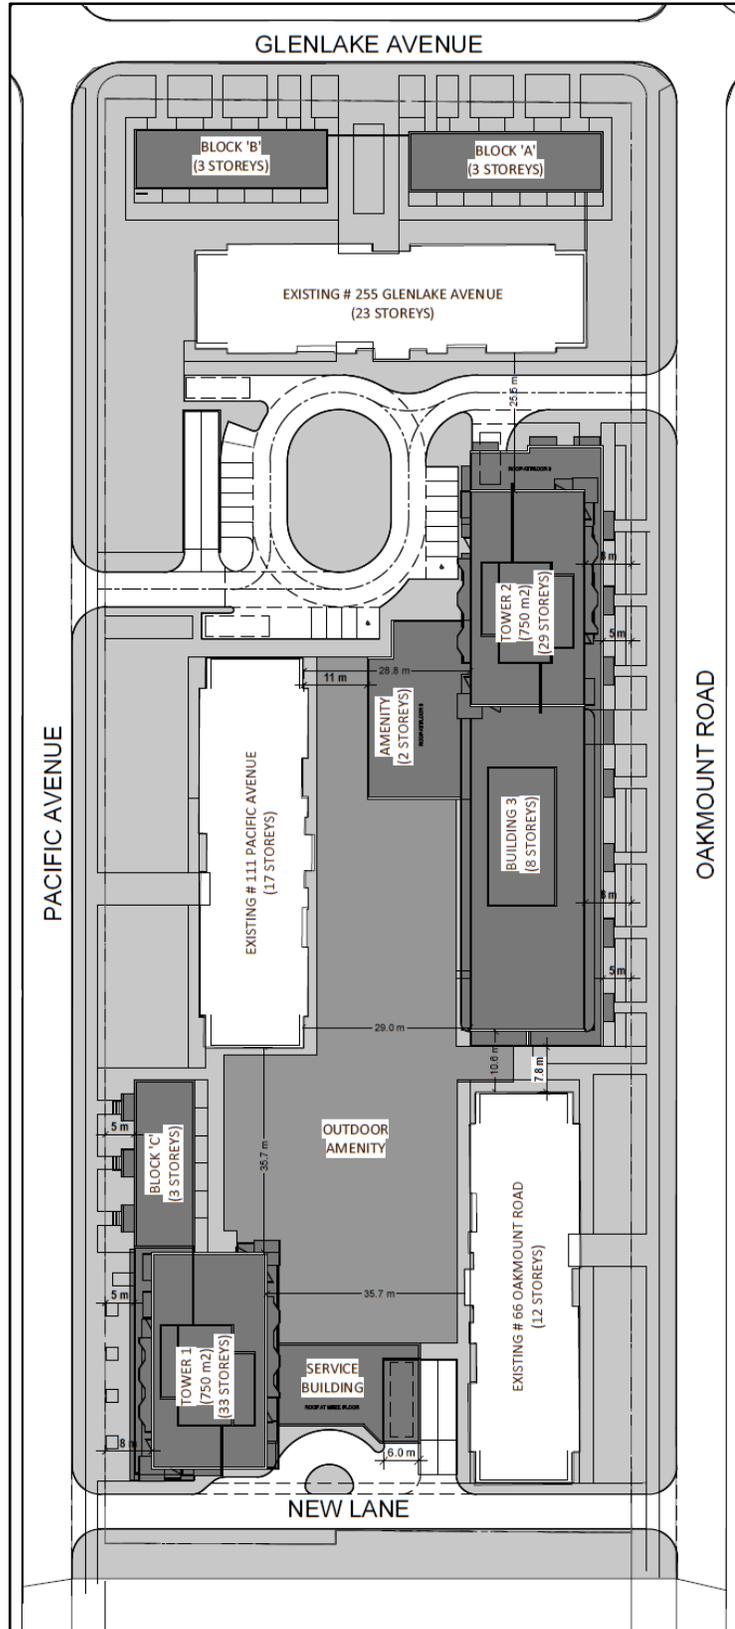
Proposed Site Plan for 111 Pacific Avenue site (Hariri Pontarini Architects, 2017)
